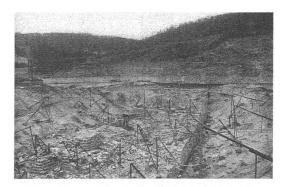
Construction of New Croton Dam. Arrangement of derricks. (USA)
